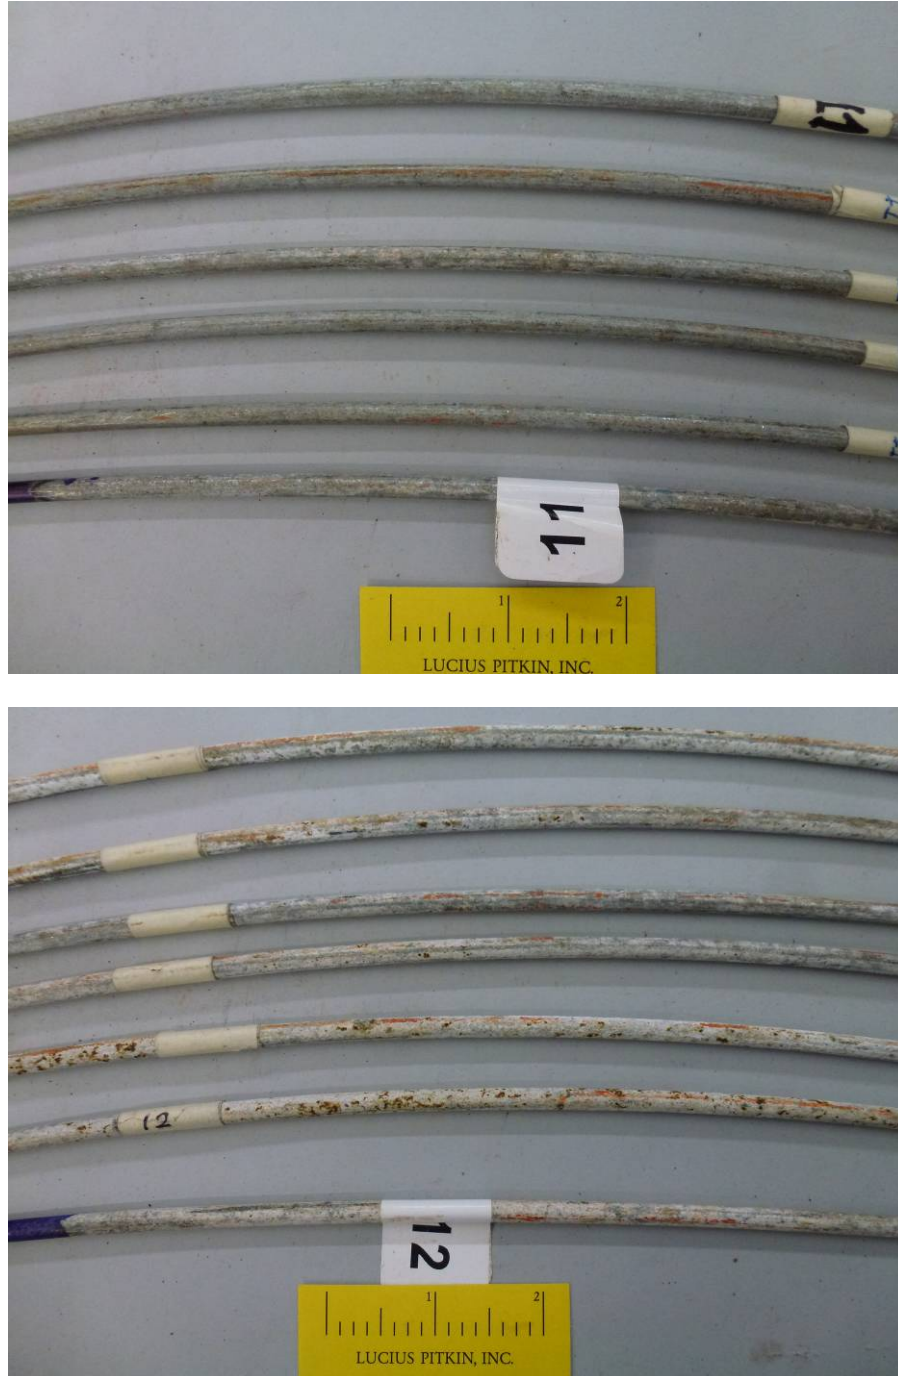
Views of wire 11 and 12 surfaces (see Table 2).
